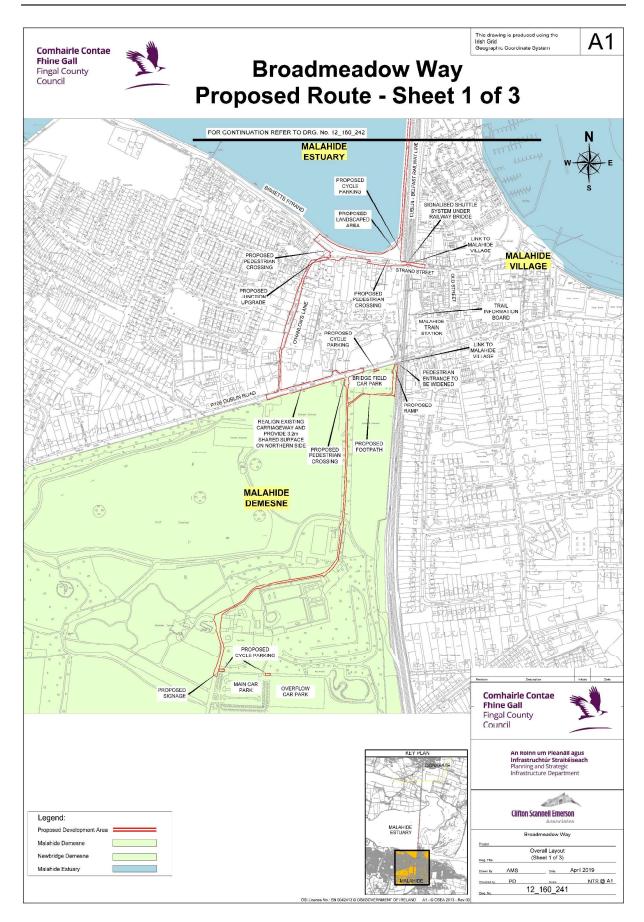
Site Location and General Site Setting - Sheet 1 of 3.
